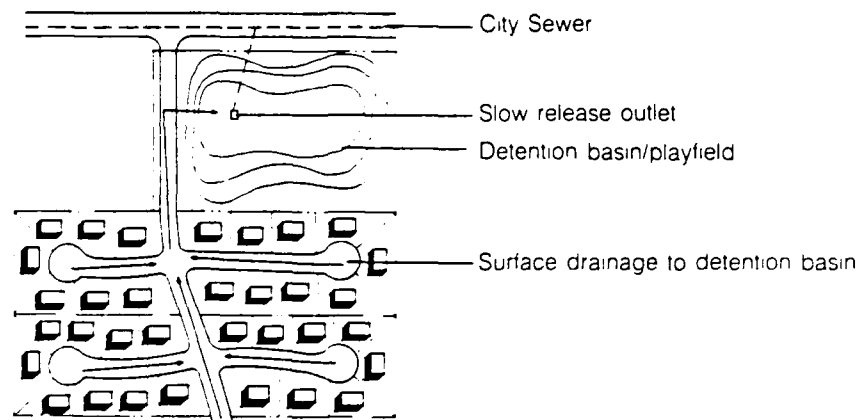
Alternative Layout For Storm Drainage System. (From Building Affordable Homes, HUD.)
